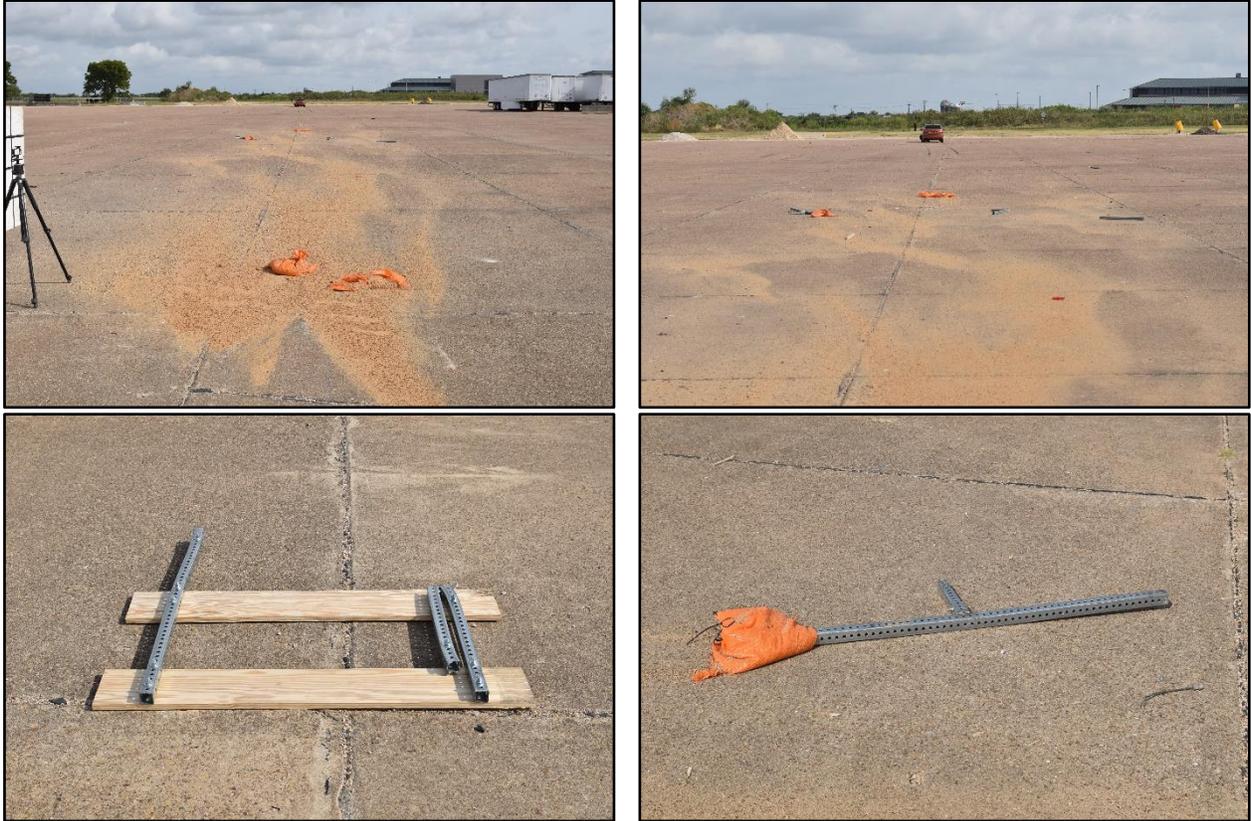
Type III Barricade after Test No. 469469-12-01.
